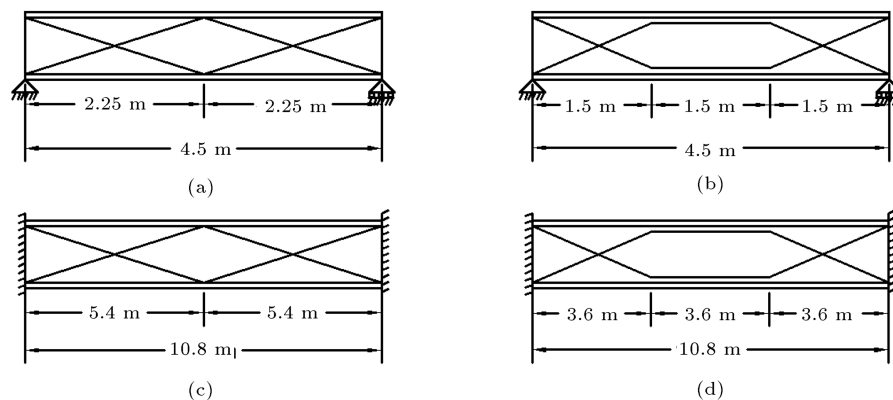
The locations of cables in the beams: (a) Simply supported beam along with the V-shaped pattern of cable, (b) simply supported beam along with the modified V-shaped pattern of cable, (c) fixed supported beam along with the V-shaped pattern of cable, and (d) fixed supported beam along with the modified V-shaped pattern of cable.
